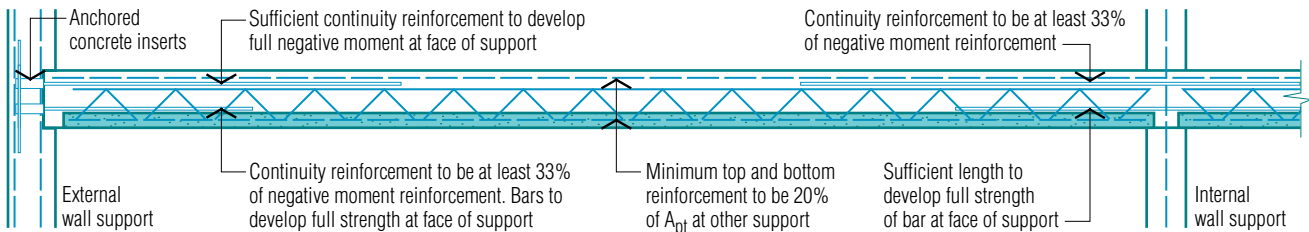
TYPICAL SLAB REINFORCEMENT DETAILS FOR EARTHQUAKE LOADING (AS 3600)
